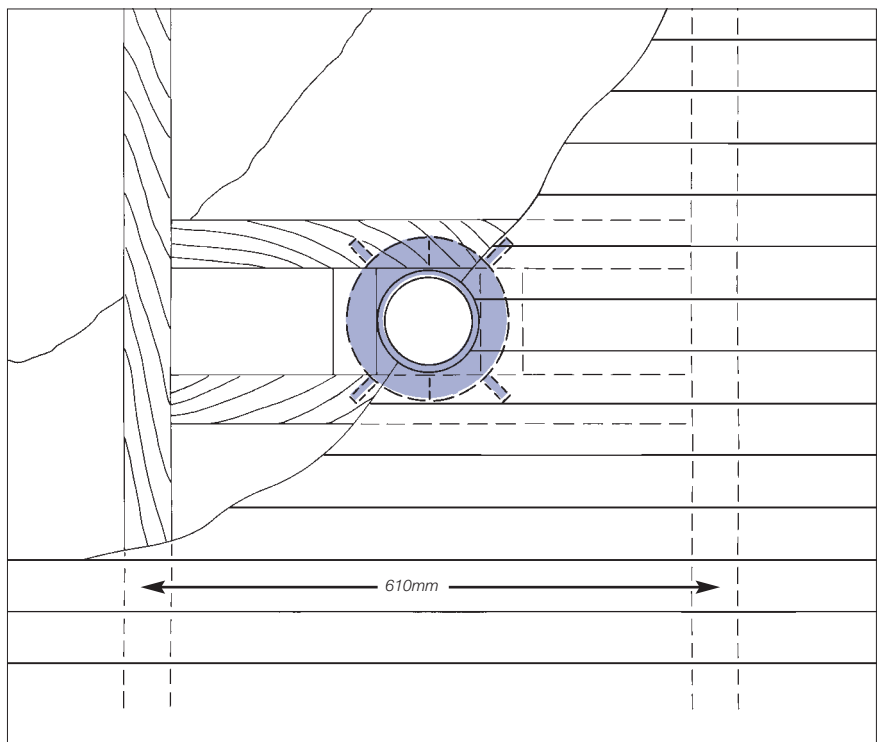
Plan view of OSMA Fire Stop Seal under a timber floor
